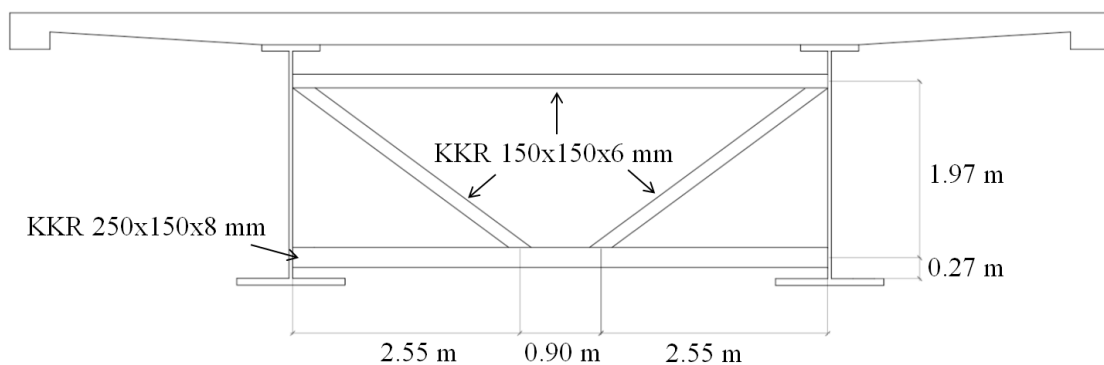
Dimensions of cross bracings in existing composite bridge.
